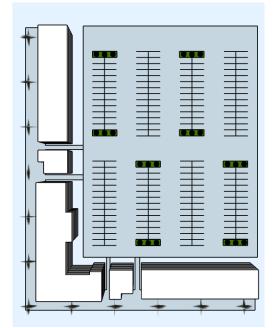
Traditional Downtown site layout with buildings brought to the edge of the sidewalk and parking in the rear.
